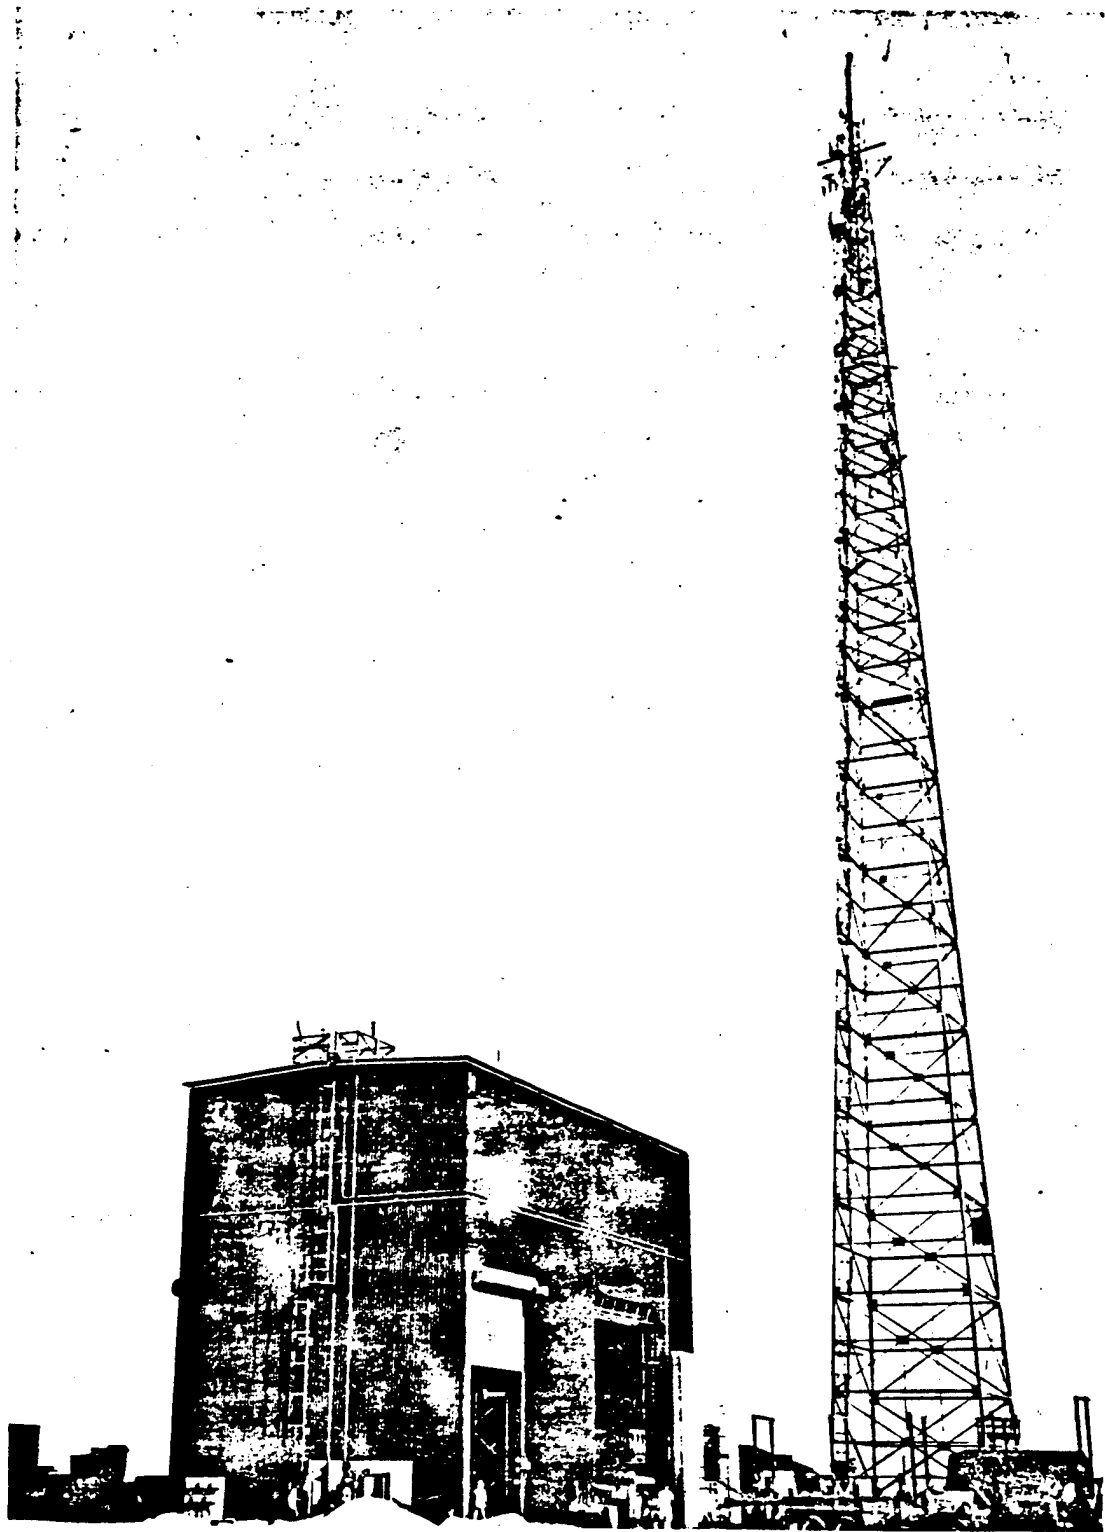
View of the 375-ft microwave transmitting tower at site zero during its last days of construction.
